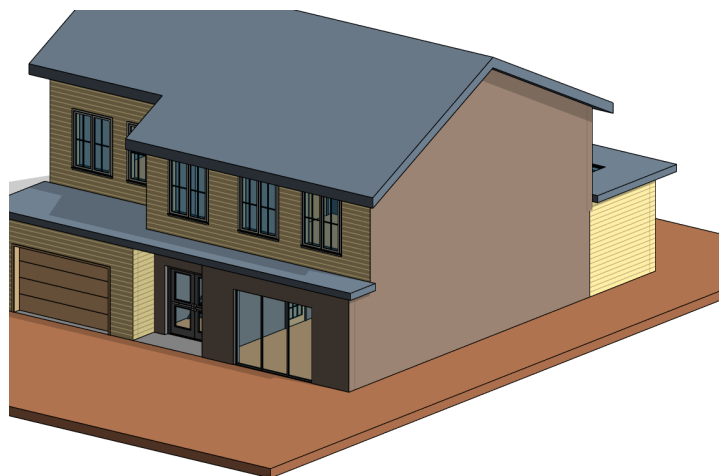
Location of wall replaced with Exterior – Stone on Mtl. Stud wall type.
